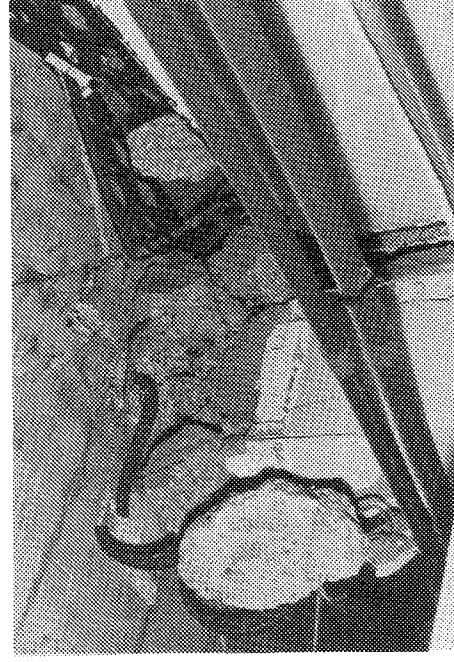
SHEAR FAILURE AT TOP OF COLUMN P-16 SUPPORTING COURTYARD
